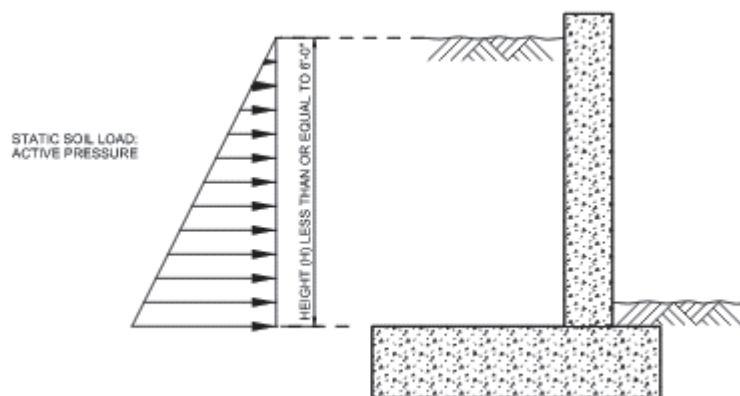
Retaining Walls with Backfill Height Less Than or Equal to 6'-0"
